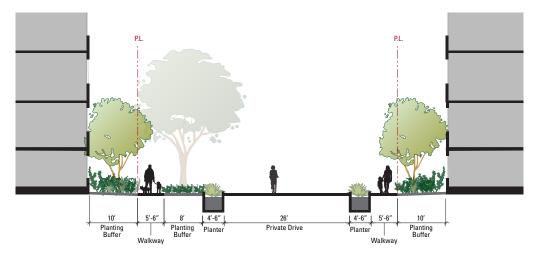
Section H. Garner Drive and Tubman private drive typical section
